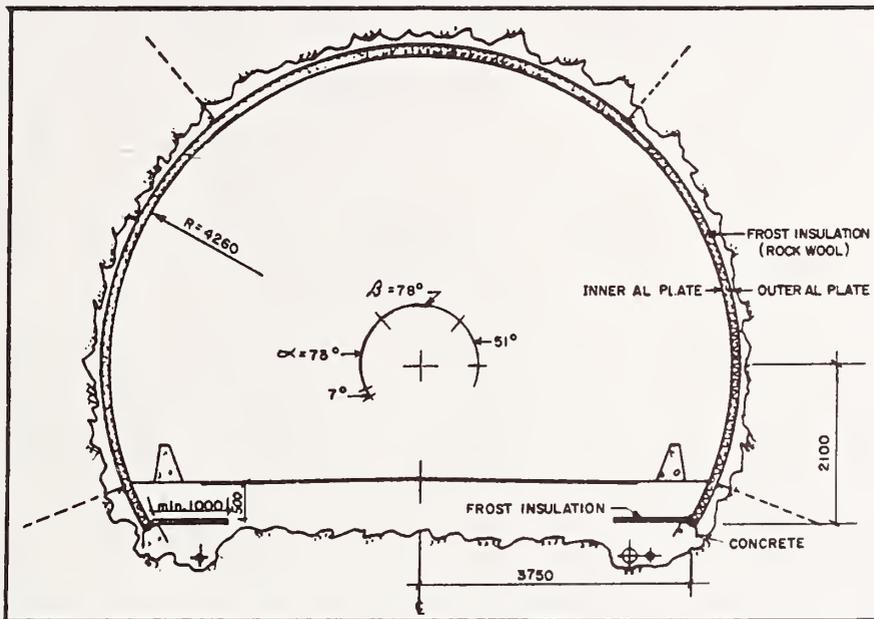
ROAD TUNNEL CROSS SECTION SHOWING
